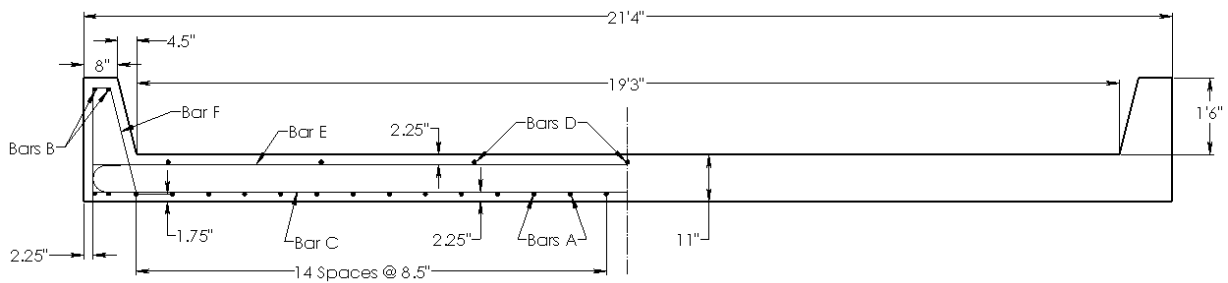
Transverse Section of Bridge CS-9 (adapted from TxDOT 2018b)
